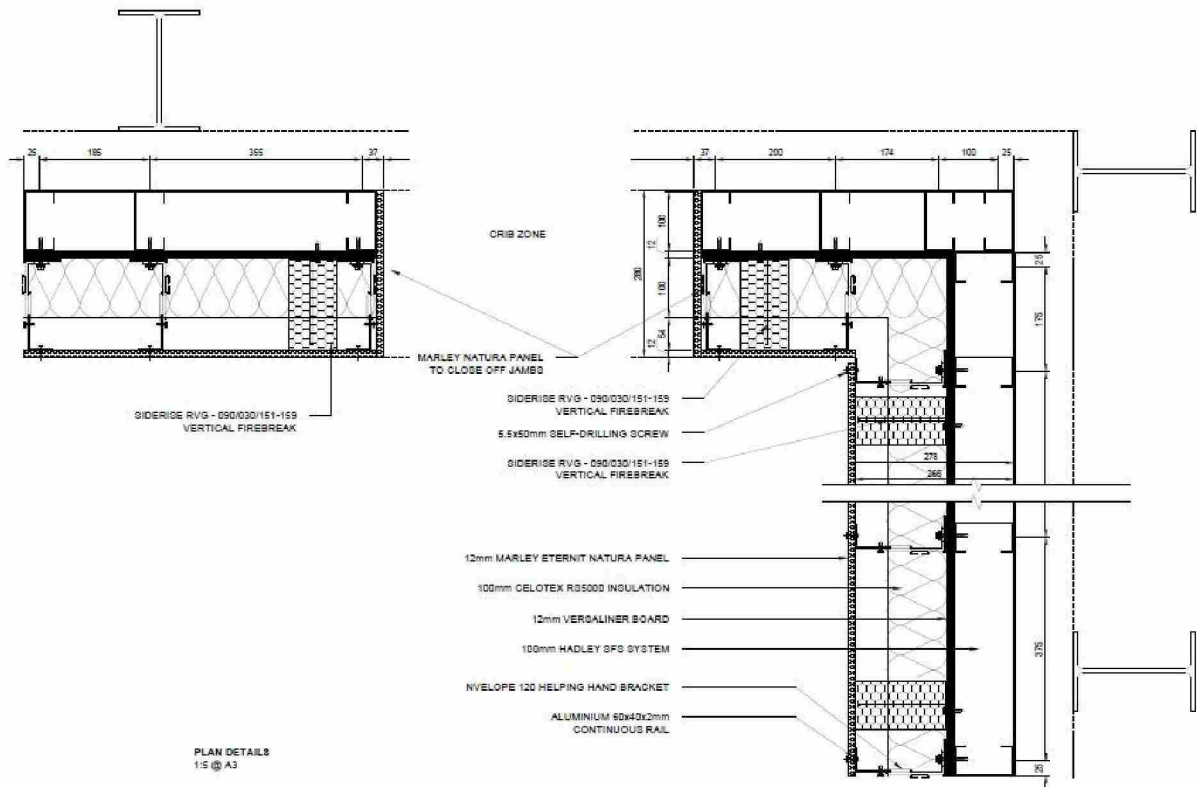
Plan view cross-section detailing layers of system (drawing supplied by Test Sponsor).
